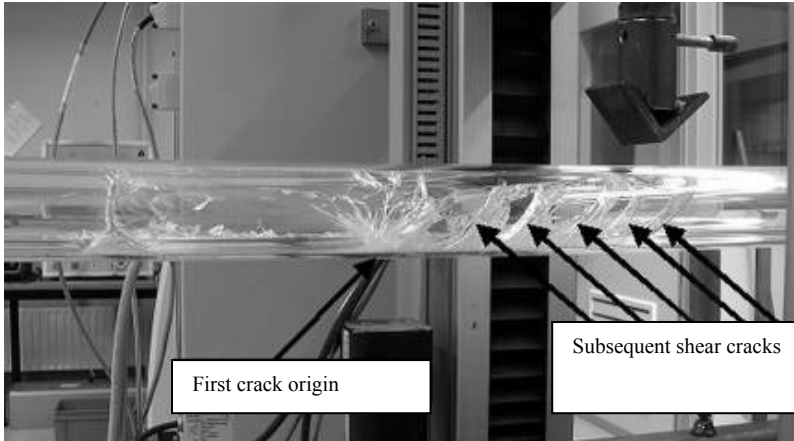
Fracture pattern in the TFS prototype after failure in the impact/bending experiment. Cracking pattern development during post-failure in impact/bending test (b, bottom).
